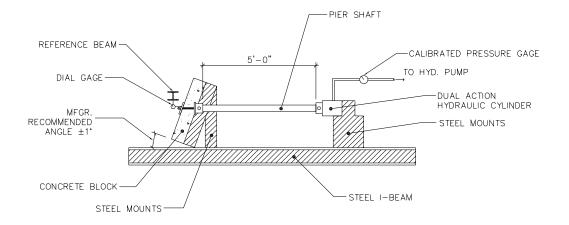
TYPE B BRACKET EXAMPLE LABORATORY TEST SET-UP
